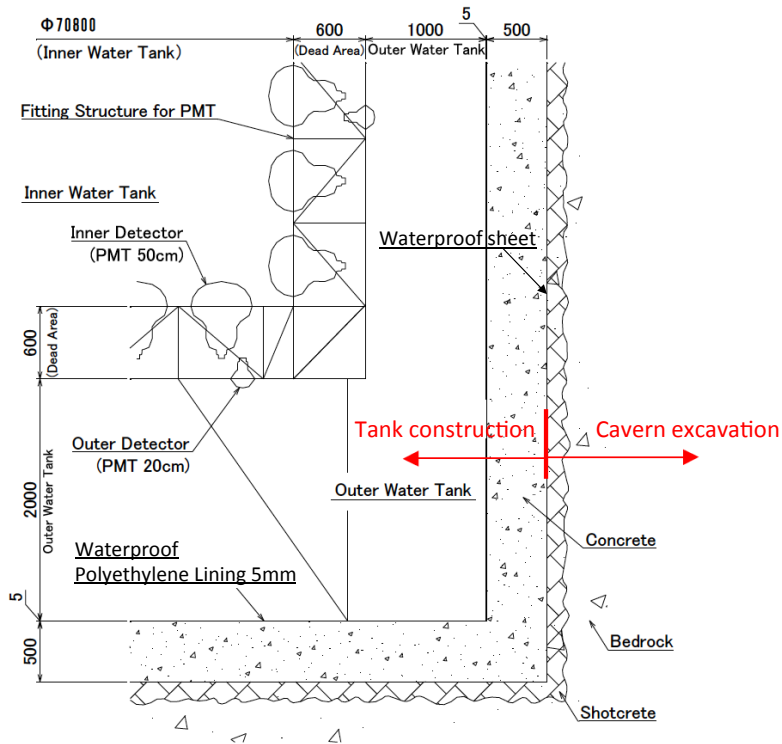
Boundary between the cavern excavation work and the water tank construction work.
